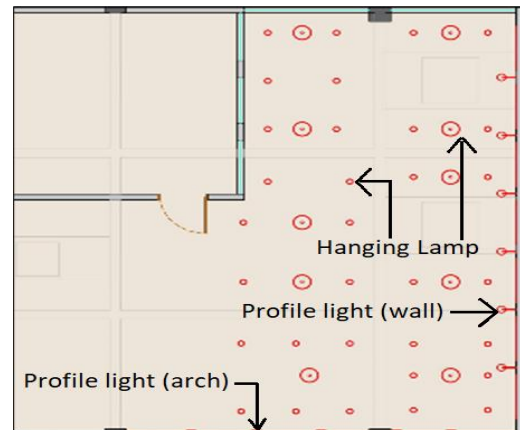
Layout of lighting w.r.t dining area floor plan at 'Masala Marke'
